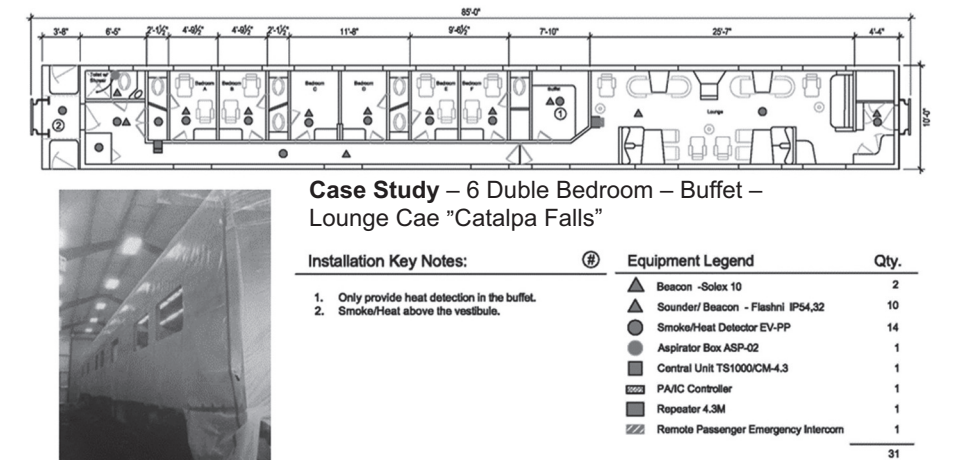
Floor plan of the *Catalpa Falls* showing the types and locations of new fire protection and life safety equipment (source: author’s own work)
